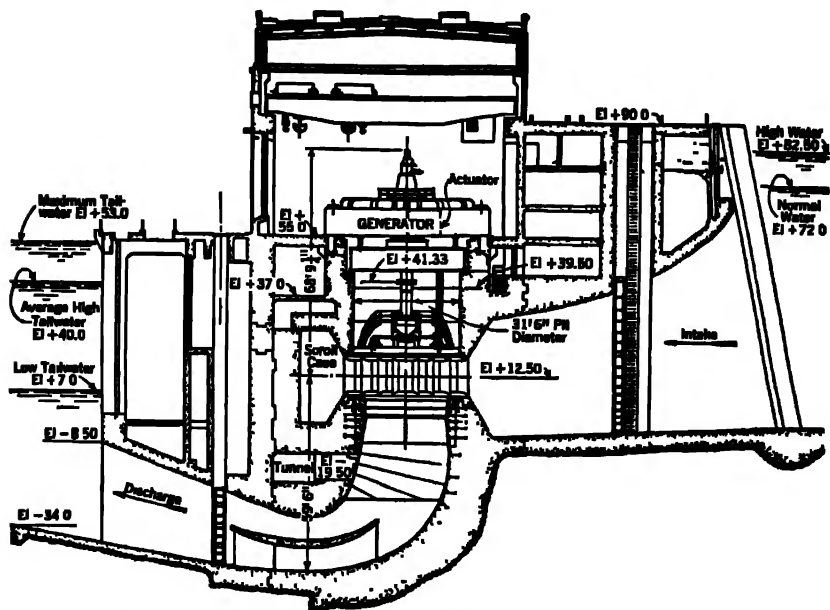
Cross-section, Bonneville powerhouse, Columbia River, Ore., Bonneville Project Administration. Two units at 60,000 hp each; eight units at 74,000 hp. Runner Kaplan 5 blades, runner diameter 280 in., 75 rpm, 60,000-hp units, head 50 ft, unit discharge 13,000 cu ft per second; 74,000-hp units, head 60 ft, unit discharge 14,000 cu ft per second. (*Trans. A.S.C.E.*, Vol. 106, p. 384, Fig. 23, 1941.)
